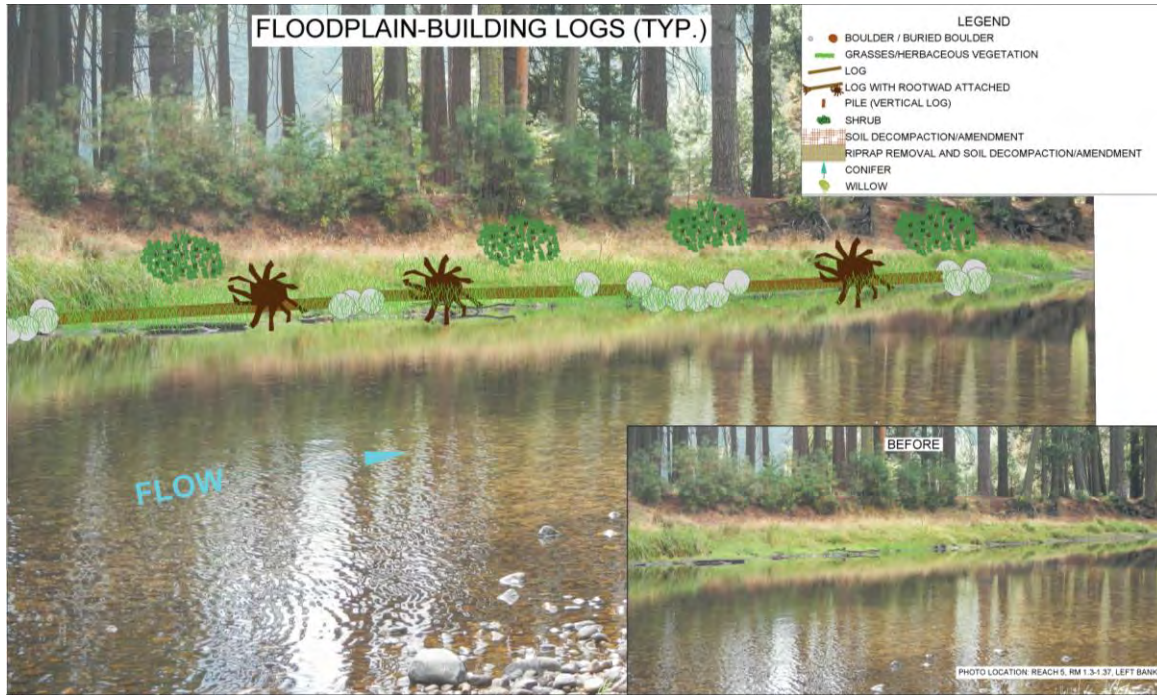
Example graphic of floodplain-building logs and revegetation.
